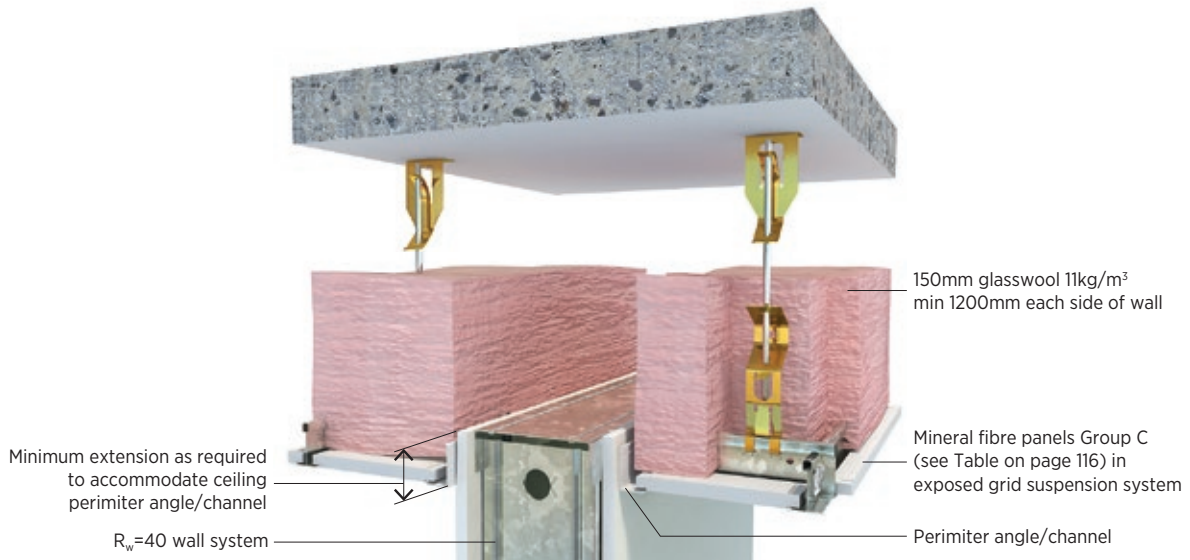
Ceiling Configuration to Maintain an $R_w = 40$ Wall Acoustic Rating (System OP.4 shown)
